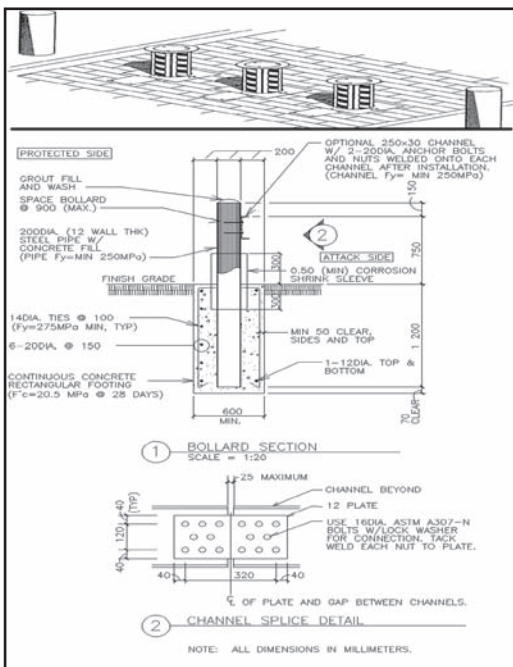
Typical Bollard Construction Detail (Above: Retractable bollards; Below: Fixed bollard construction detail) (UFC 4-022-02)
